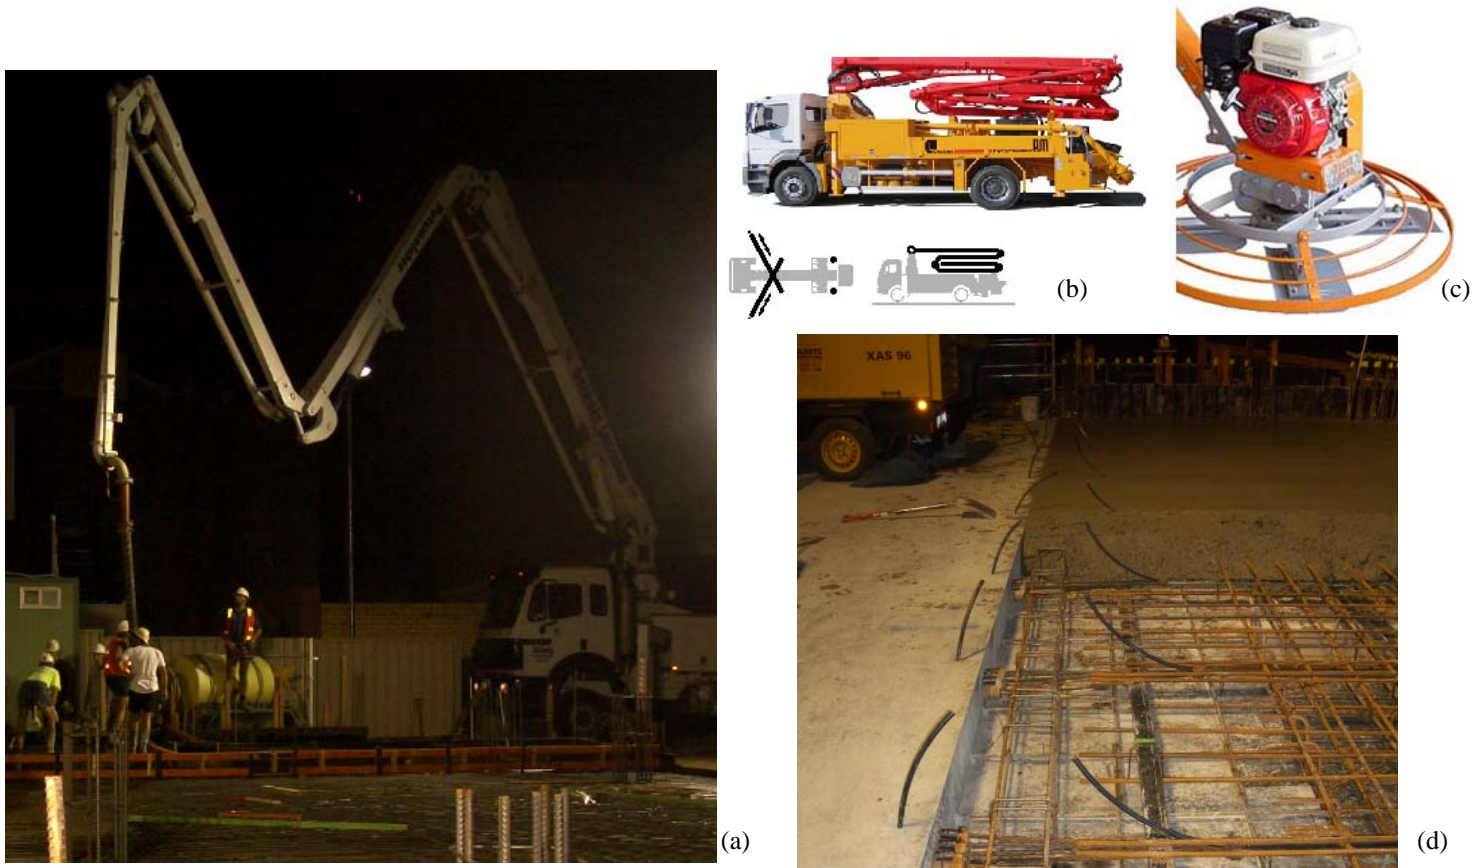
Concrete placement and finishing techniques used for the PPS slabs at 151 Pirie
